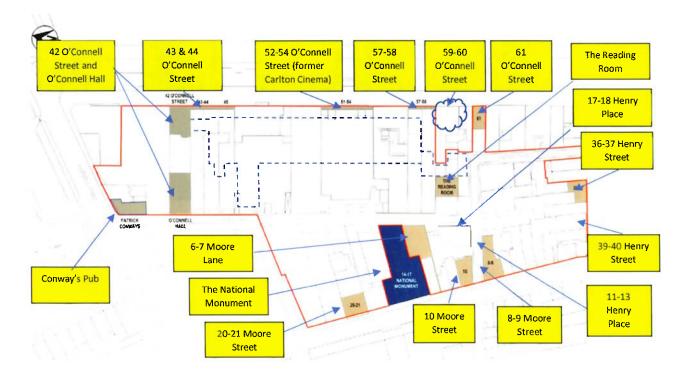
Protected Structures and non-protected structures proposed to be retained.
